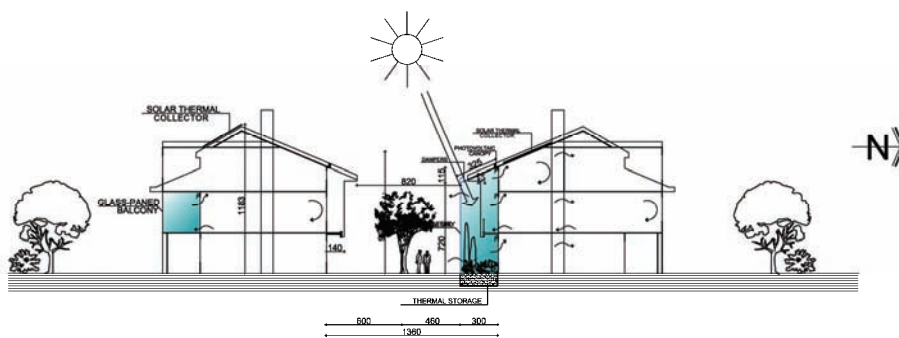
The cross-section of houses with glass-paned balconies, attached conservatories and installed solar thermal collectors in the roof
